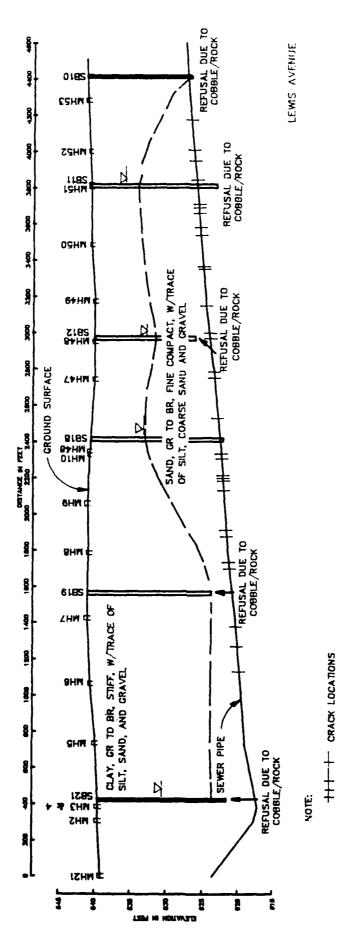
Soil Profile and Crack Locations on Lewis Avenue
